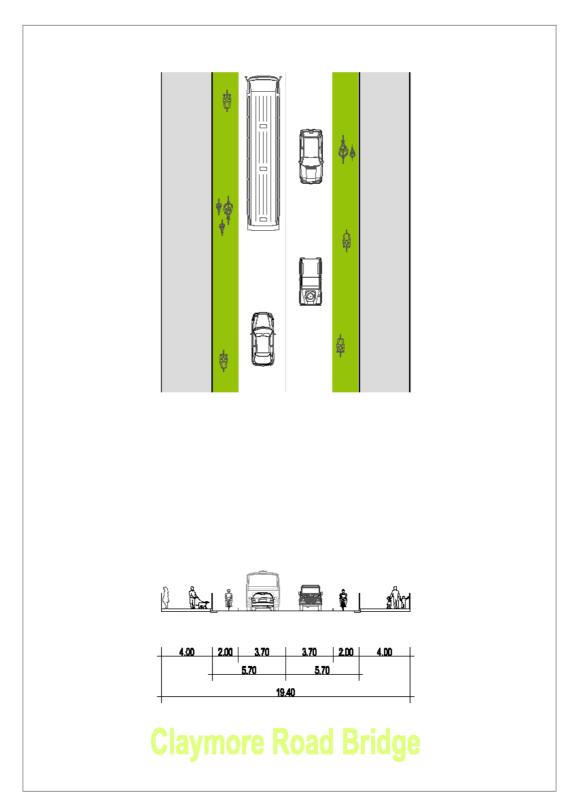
(c) Sub-arterial Road Type B Typical Cross Section
